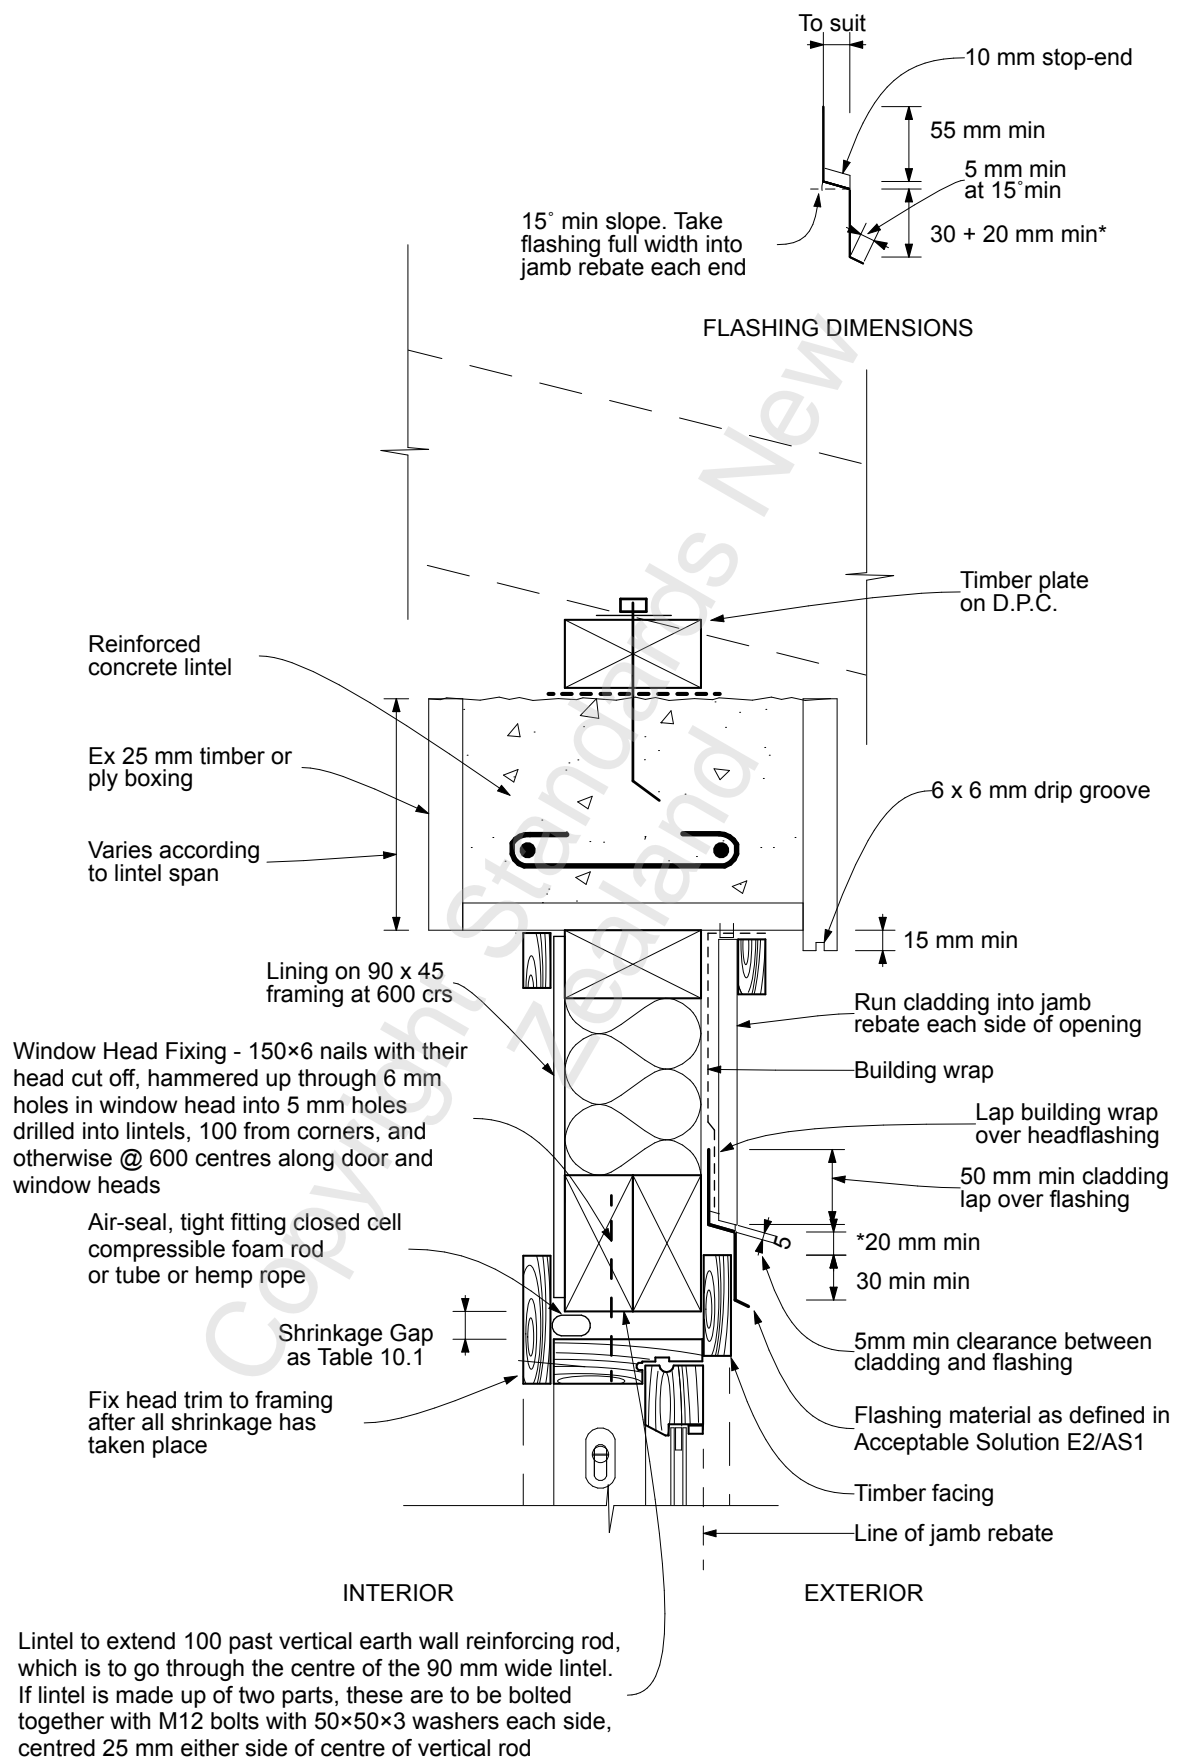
Window head – Timber joinery with timber-framed wall insert
